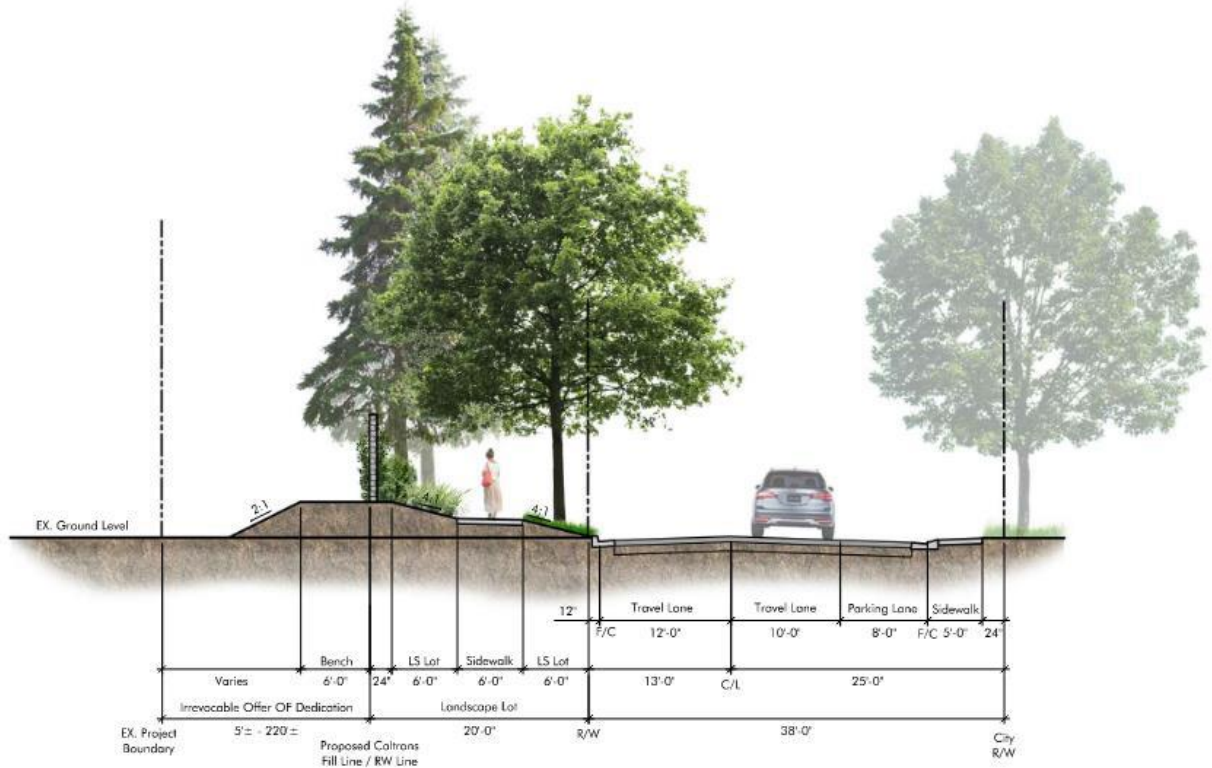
Interior Street along Caltrans Right of Way
